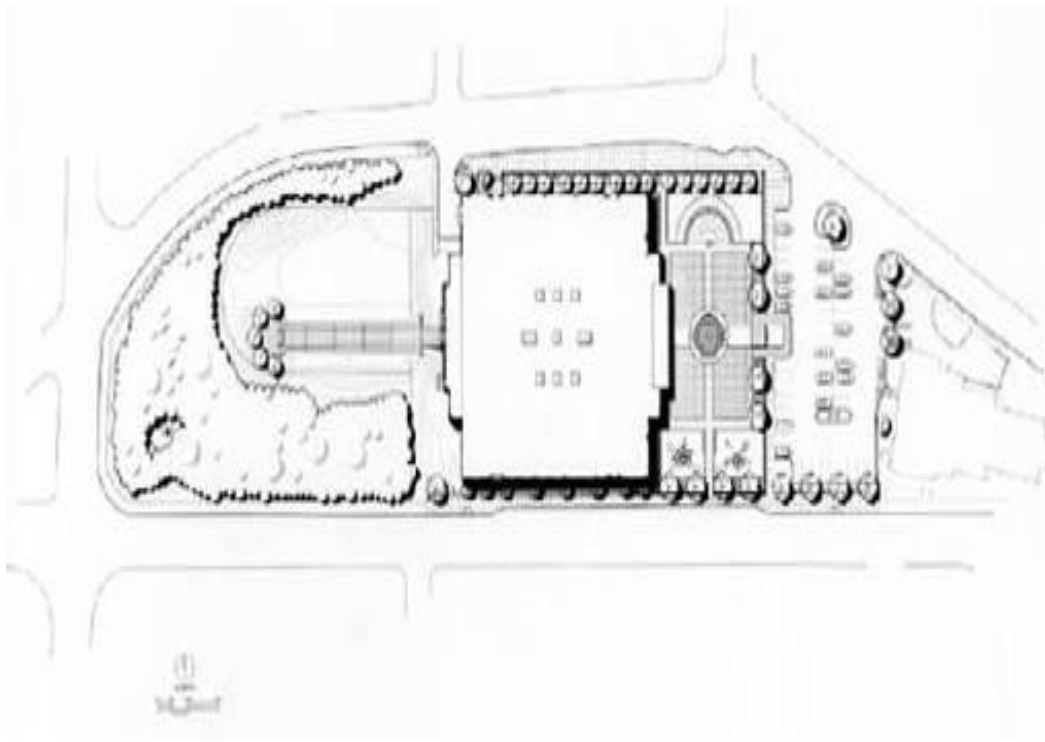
Beebe School, Malden, Massachusetts: Site Plan
